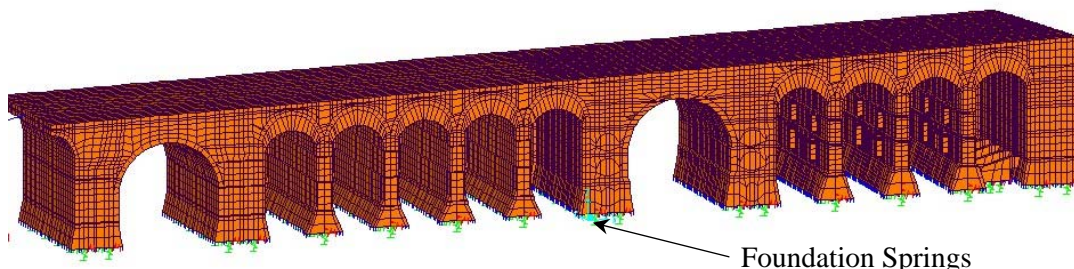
Model of Manhattan Approach Arch Block C with foundation springs (Infill Walls not included)
